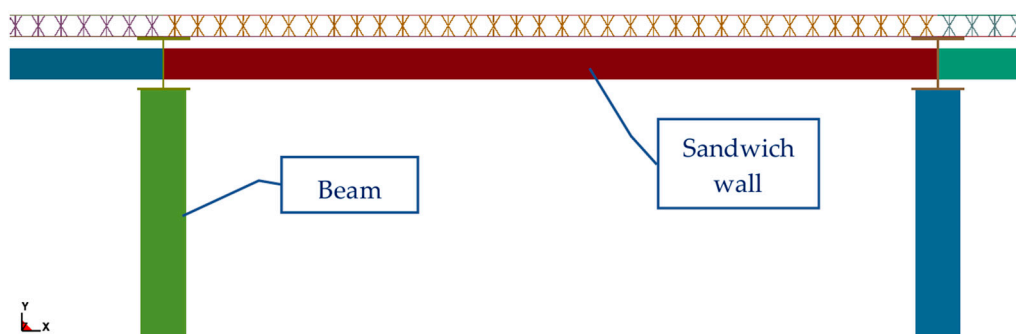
Connection between sandwich panel blast-resistant wall and steel columns (top view).
